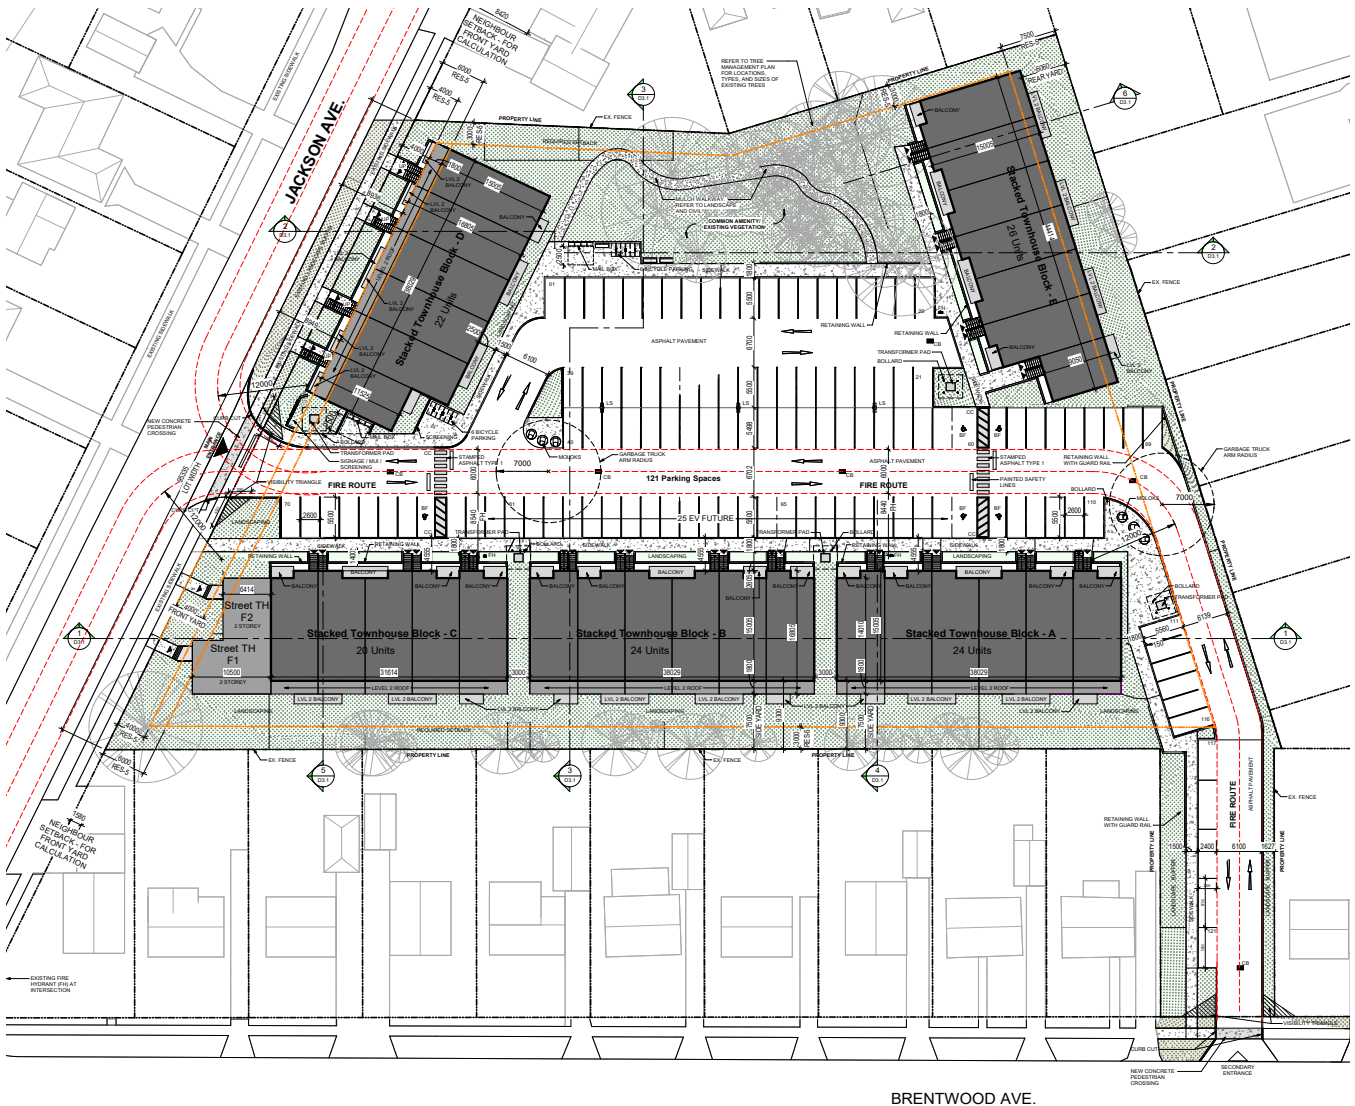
Proposed Site Plan (SRM Architects + Urban Designers, March 21, 2024)
